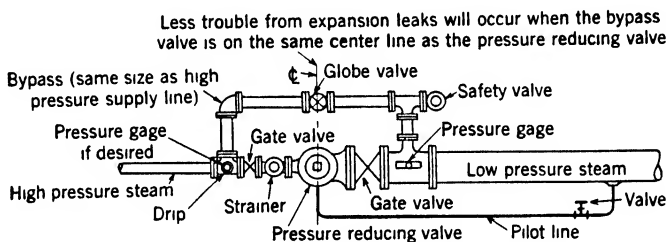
TYPICAL PRESSURE-REDUCING VALVE INSTALLATION
